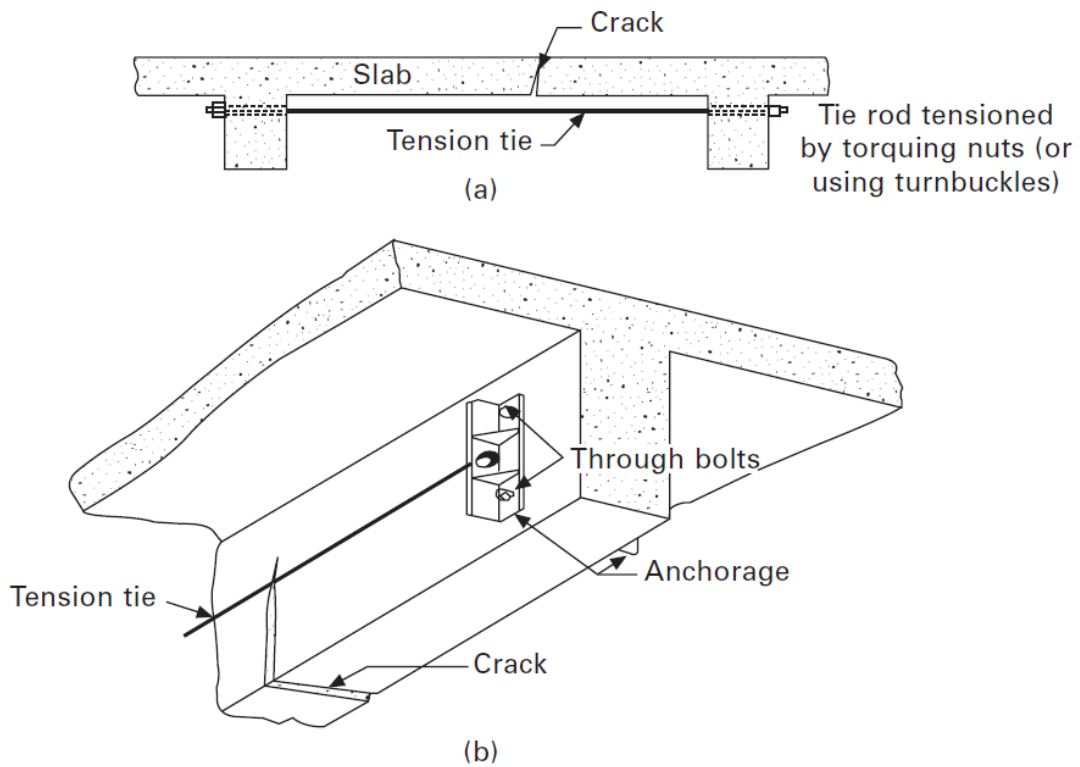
Examples of external pre-stressing: (a) to correct cracking of slab; (b) to correct cracking of beams (Johnson, 1965).
